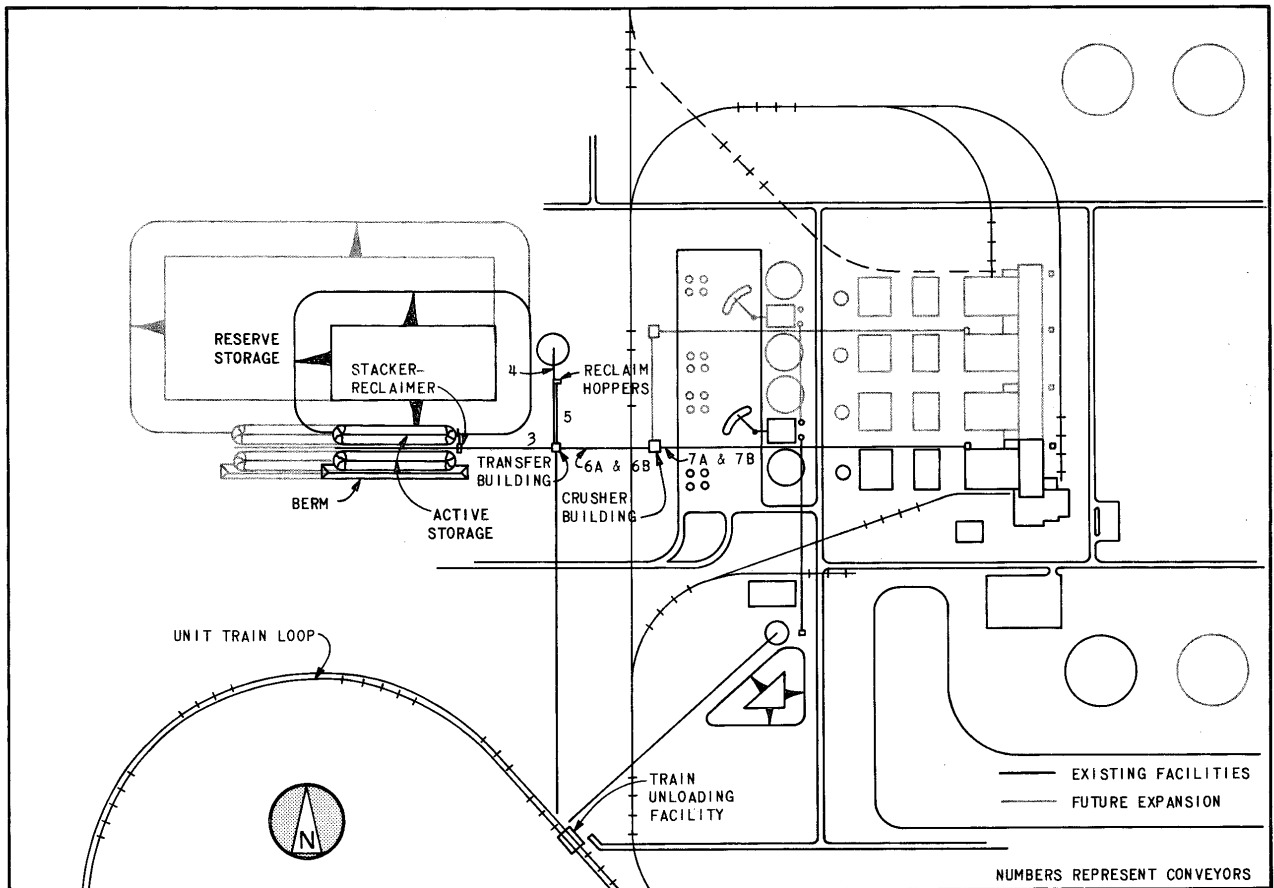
COAL HANDLING SYSTEM LAYOUT
